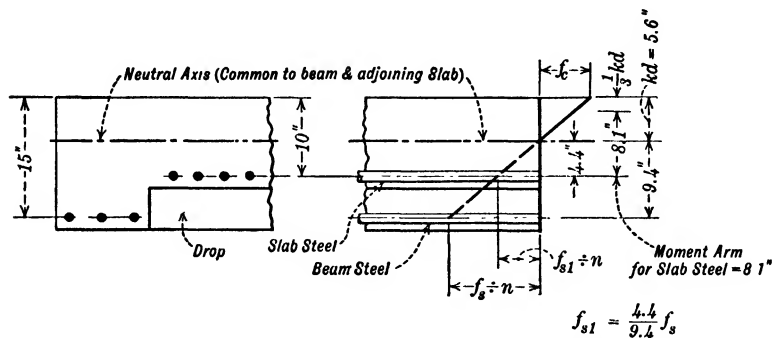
Stresses in Beam and Slab Reinforcement at Wall Beam. (See p. 380.)
